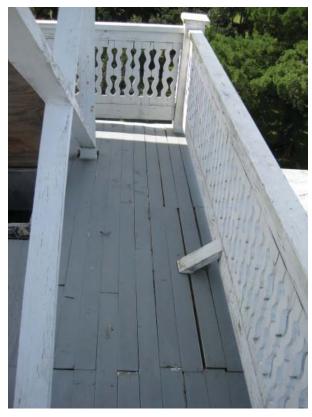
, Modern flooring, X-bracing, and balustrade of the widow's walk and cupola.
